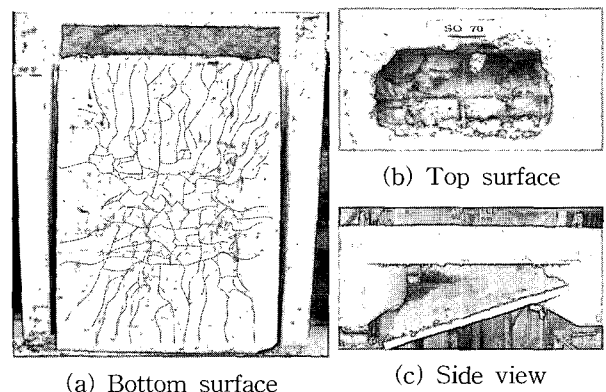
Crack and failure pattern of CR-UE70 specimen
